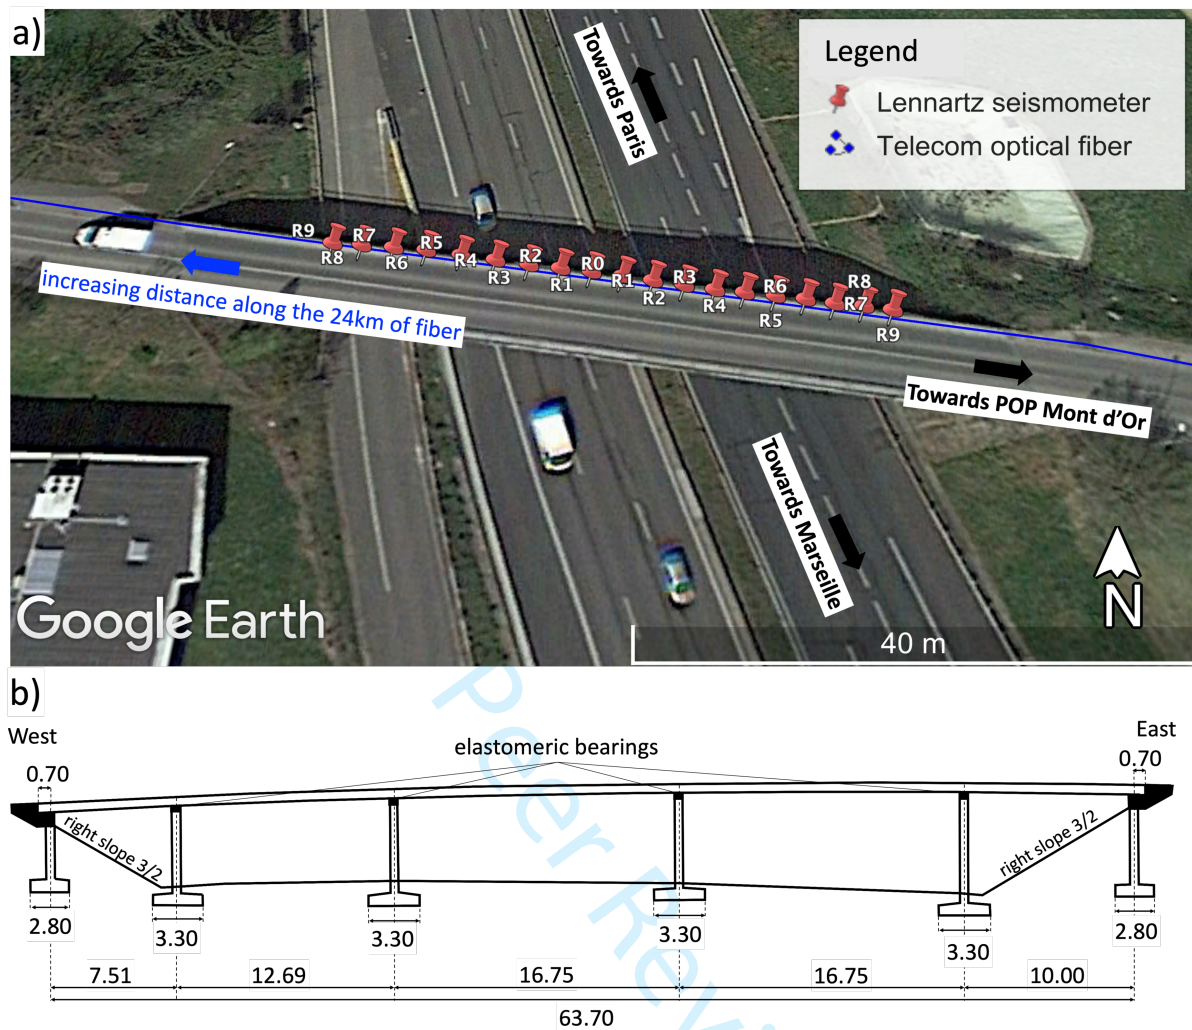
a) Satellite image of the Bridge 1 (Paisy bridge) crossing the A6 highway, with the positions of the velocimeters used to acquire conventional measurements. b) Longitudinal section of the Bridge 1 (modified from a plan of the Ministry of Equipment, Rhône Department, Boussiron Company). The dimension is given in meters.
